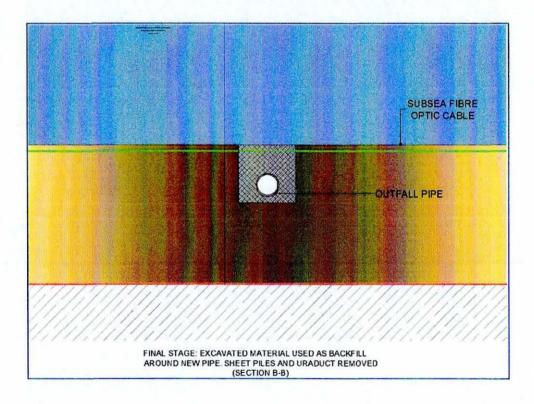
Fibre Optic Cable Crossing - Stage 3 - Backfill Trench
